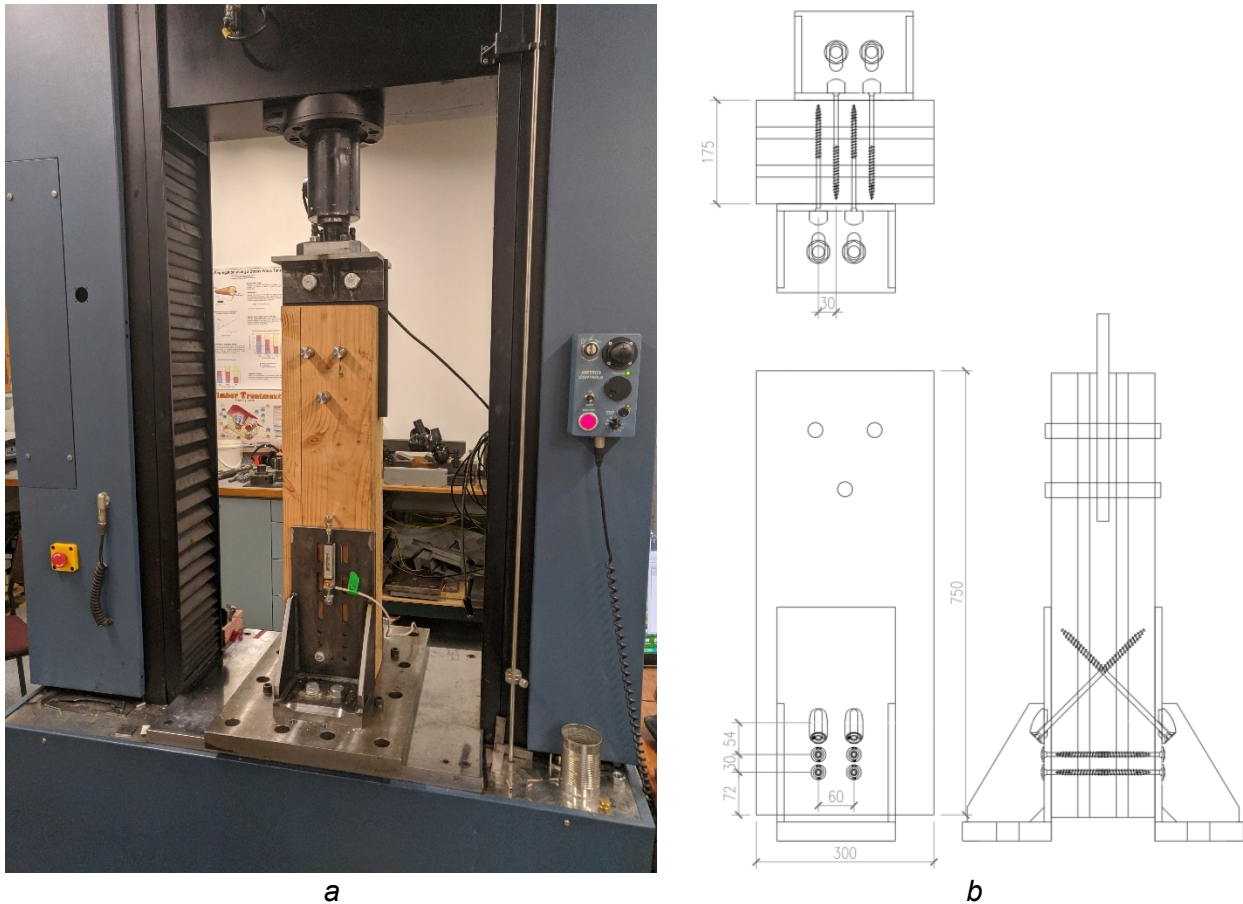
Phase 1 testing setup (a – Picture of testing setup, b – drawing of testing setup)
